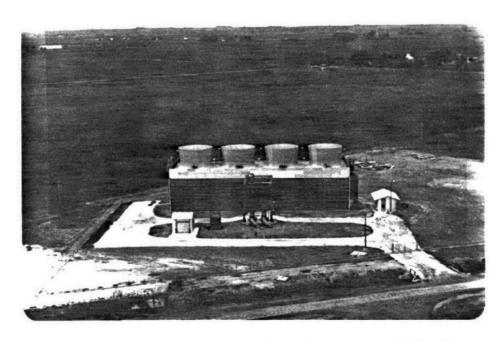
View from the boiler house roof facing northeast showing the cooling tower and the surrounding area.
